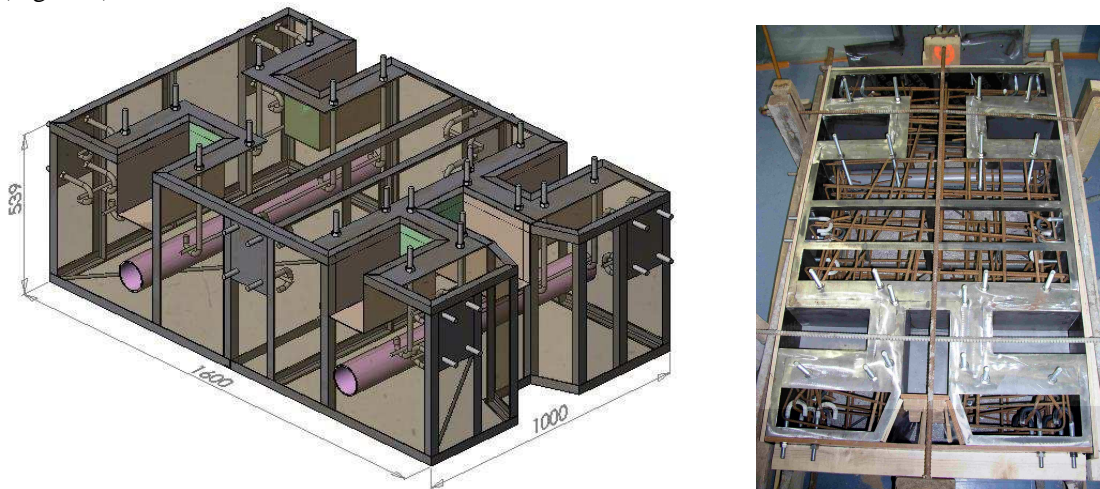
Block structure model and picture of the iron framework made before pouring concrete
